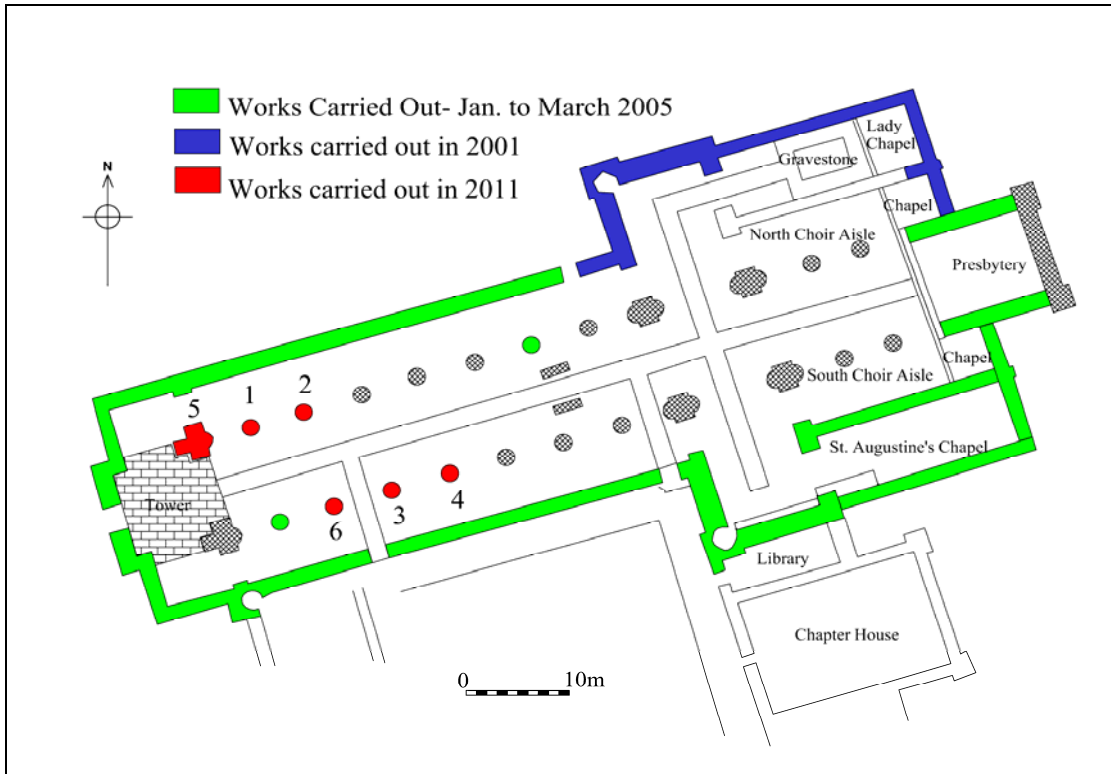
Plan of abbey church, with current watching brief area highlighted in red.
